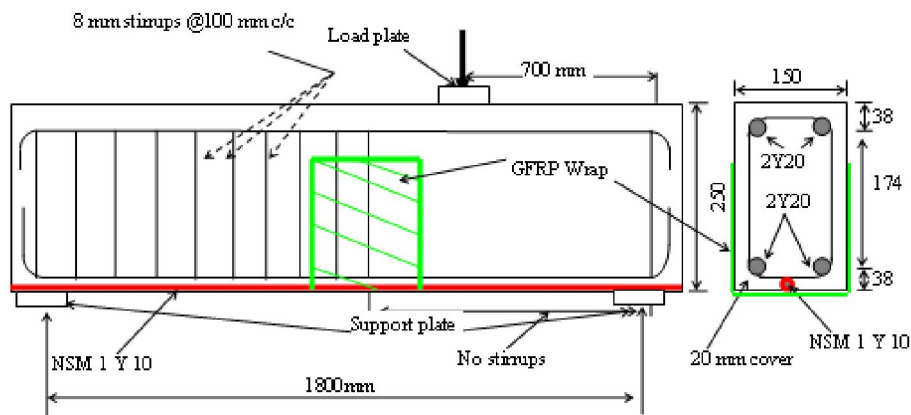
Loading arrangement of test reference without shear stirrups beam (RWS)
